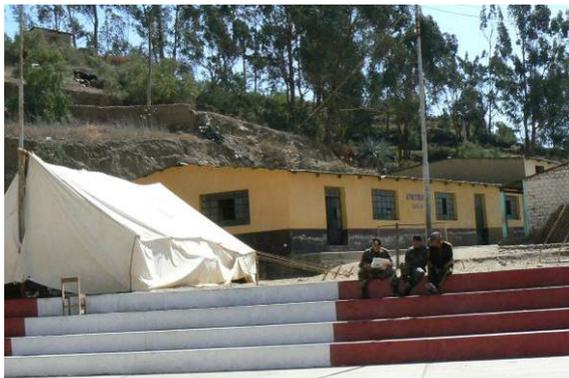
Non-reinforced adobe building normally used as a hall, (San Juan Bautista school, Huaytara)
